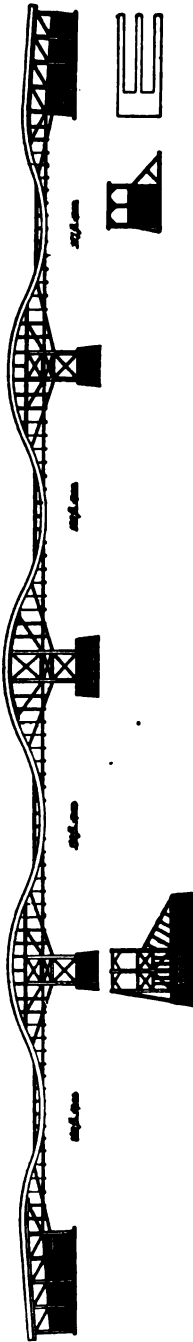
Mohawk Bridge at Schenectady, N. Y. Built by Theodore Burr.
